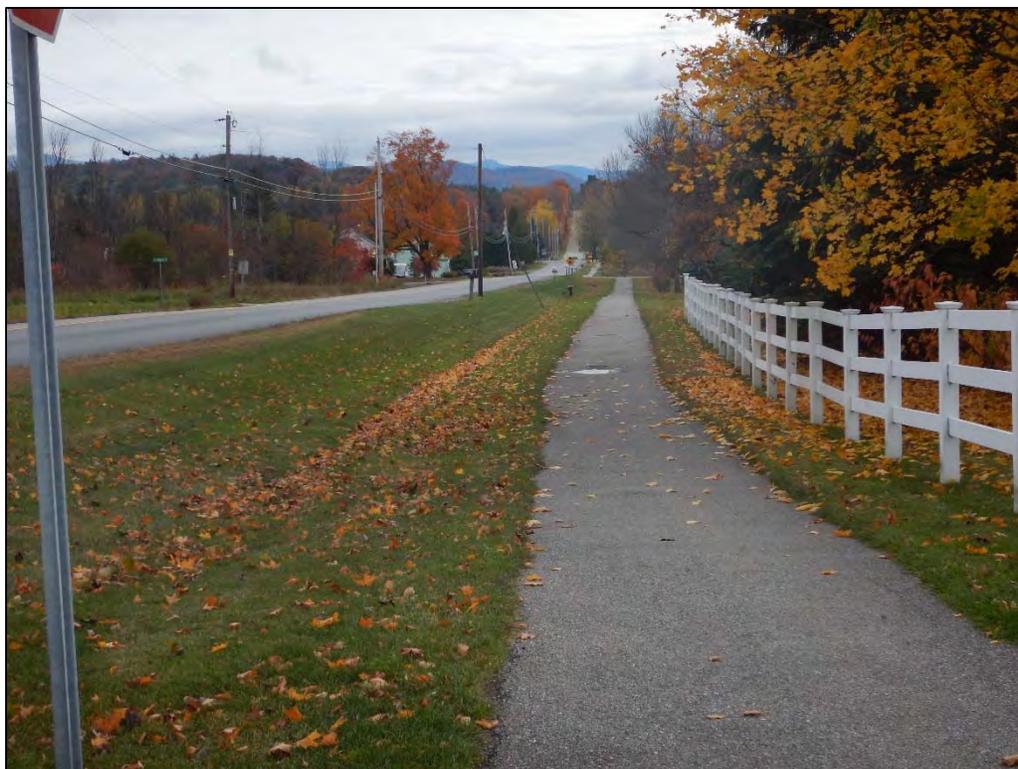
Project alignment at Station 135+20. Note road embankment, drainage ditch and existing sidewalk. View to the southeast.
